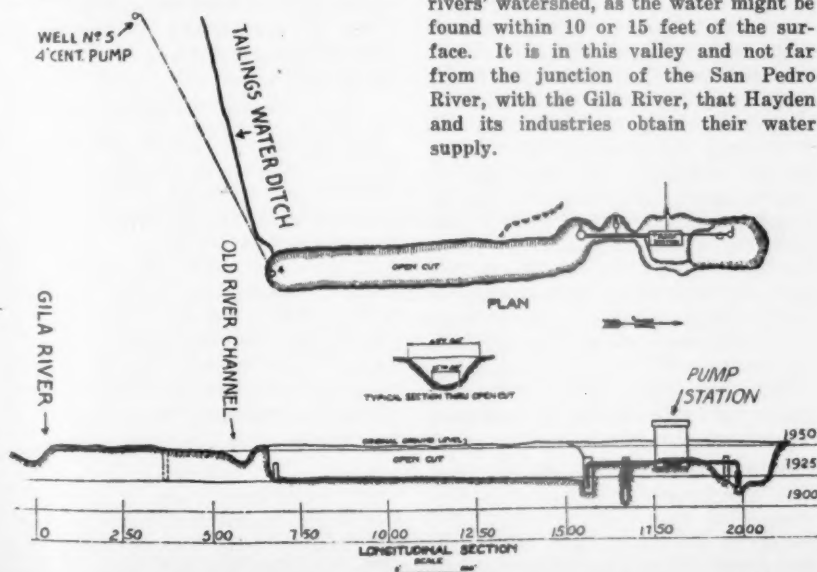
Plan and sectional elevation of open well system. Begun 1910. Abandoned 1919
